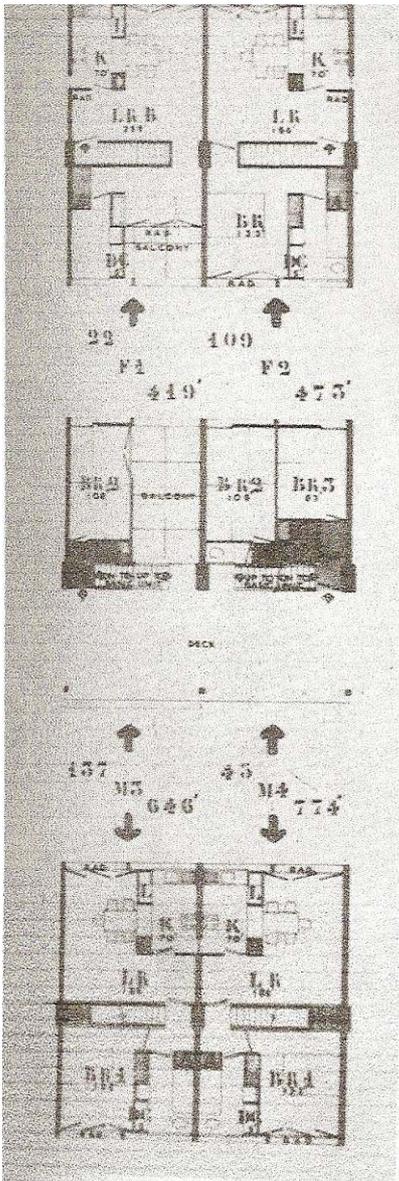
Typical Flat Plans. Top, above deck: basic units: parents. Centre, deck level: additional bedrooms: children. Lower, below deck or above deck: basic units: parents. All dwellings consist of a standard basic unit with additional bedrooms at deck level as required
